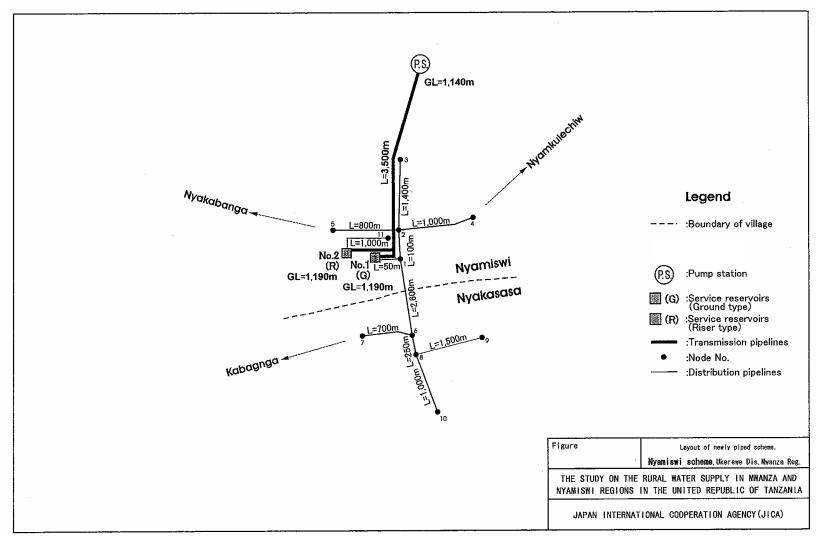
Layout of Newly Installed Piped Scheme (Nyamiswi Scheme)
